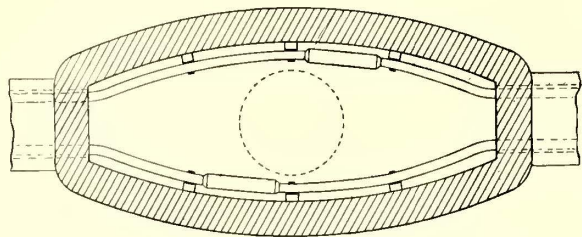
PLAN OF ELLIPTICAL MANHOLE
